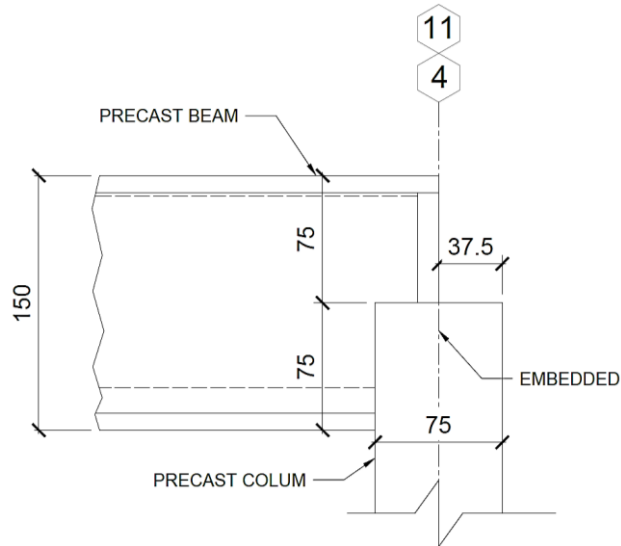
Wet joint detail at the façade axis (units in cm).
